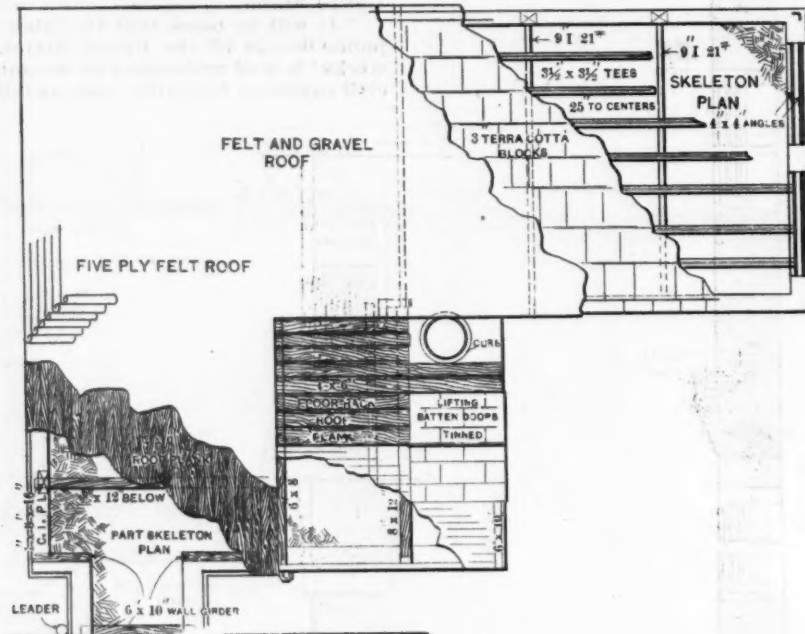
Roof Plan, Engine and Boiler Rooms.
